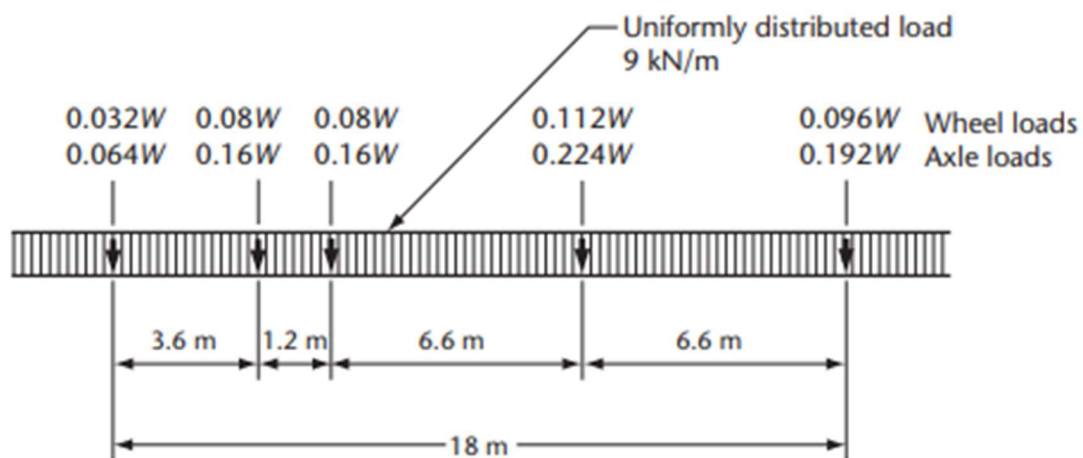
CL-W Lane Load loading details [3]
